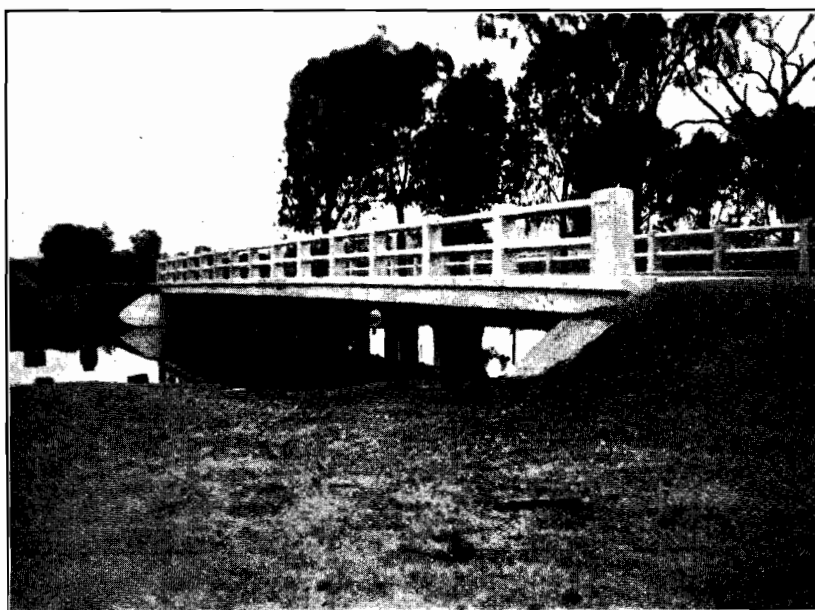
Showing new flat slab bridge over Kiewa River flats at Bonegilla on the Murray Valley Highway.
